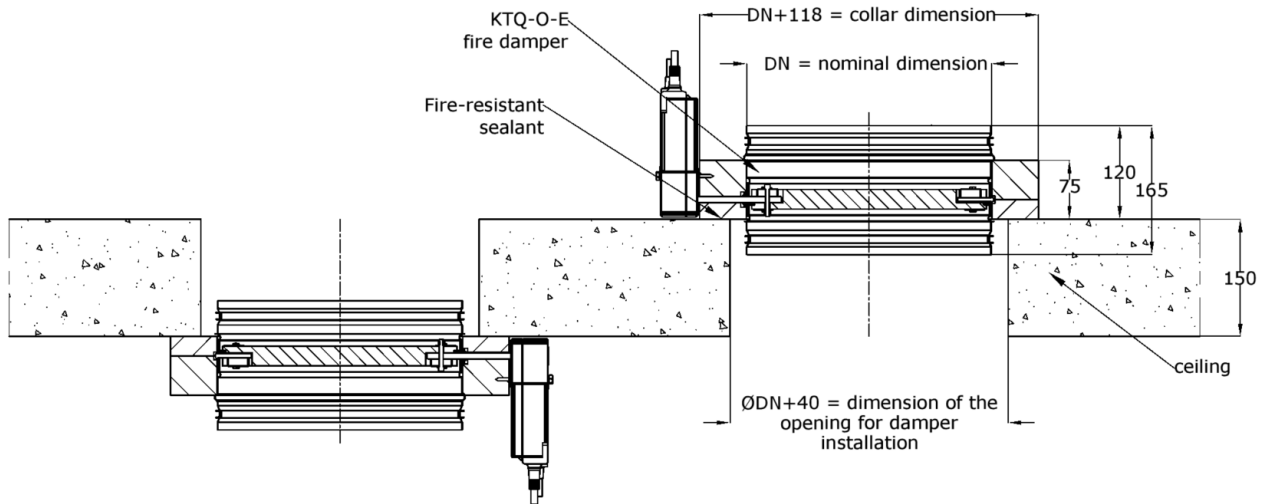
Installation method for KTQ-O fire dampers in ceiling
